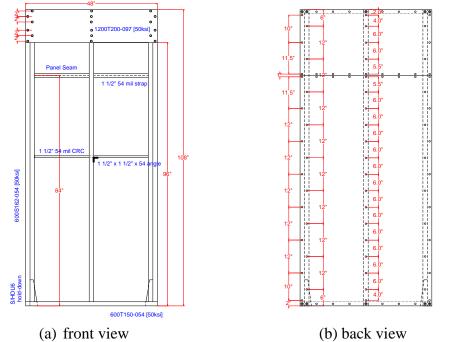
Shear wall specimen drawing (details are the same for 8 ft wide shear walls)
